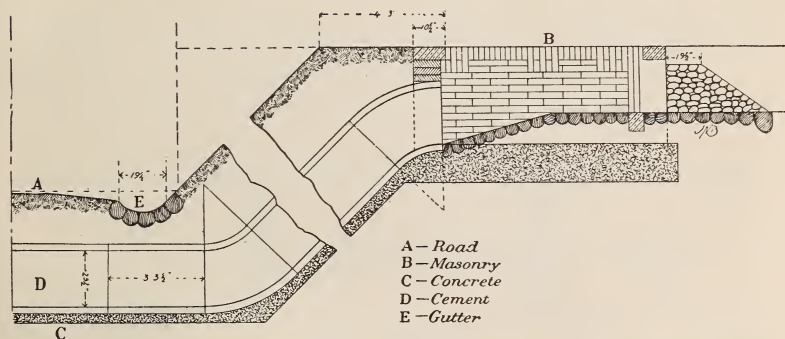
Masonry and concrete siphon carrying the water of a lateral under a road—standard plan.
